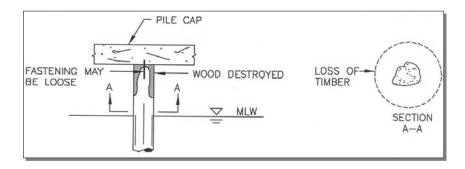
Typical Rot and Fungi Damage to Timber Piles
